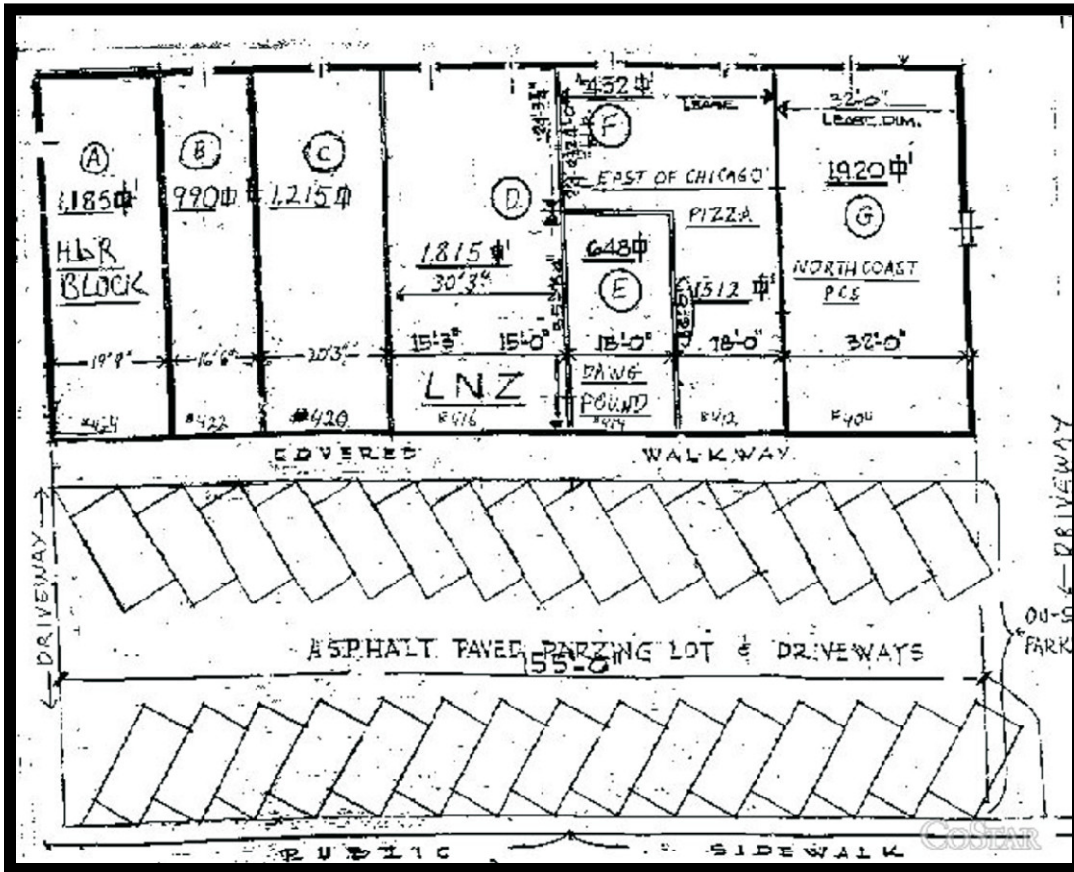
Site plan for ca. 1972 strip shopping center at Bagley Plaza, 404-424 W. Bagley Road, Berea (Showcase.com 2010b).
